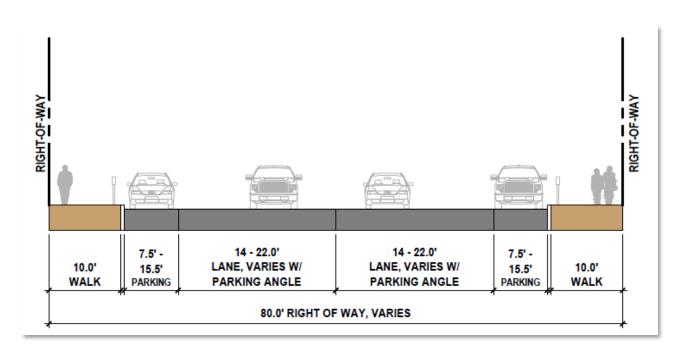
4th St - Existing Cross-Sections Between Colorado Ave & Rood Ave
